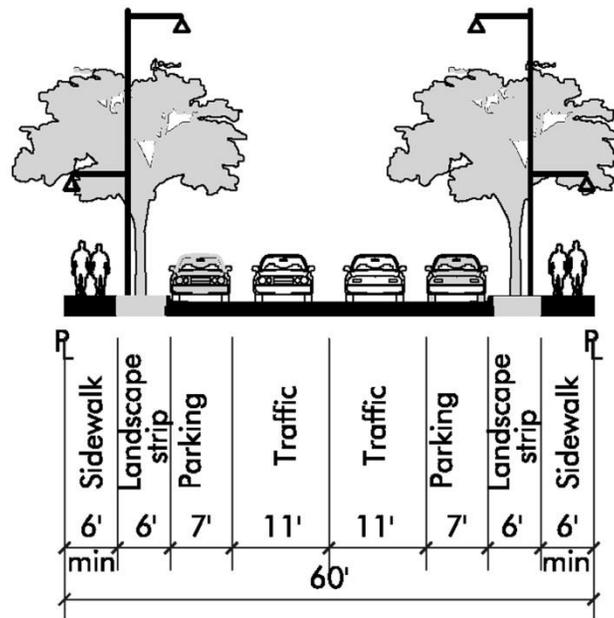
Example streetscape cross section for 18<sup>th</sup> and 20<sup>th</sup> Street
